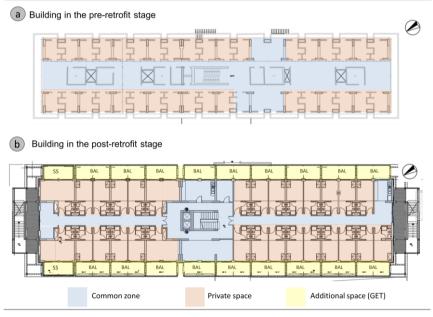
Plans of the first floor, before (a) and after (b) the renovation
